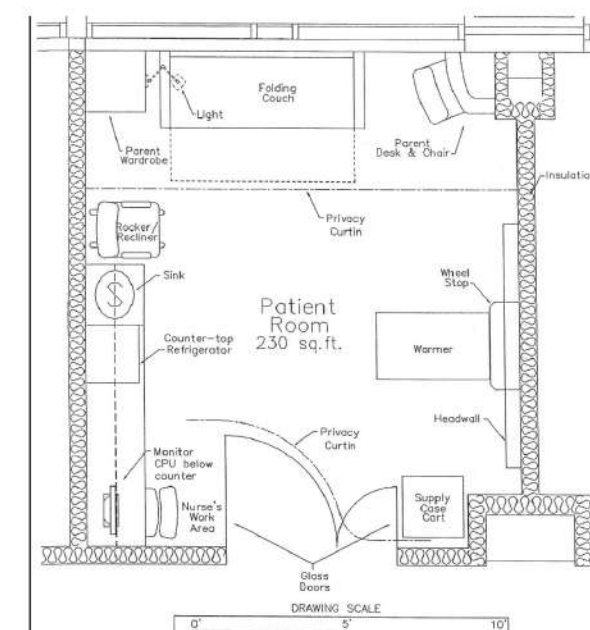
Floor plan of the single-family NICU room (Stevens et al., 2007).
